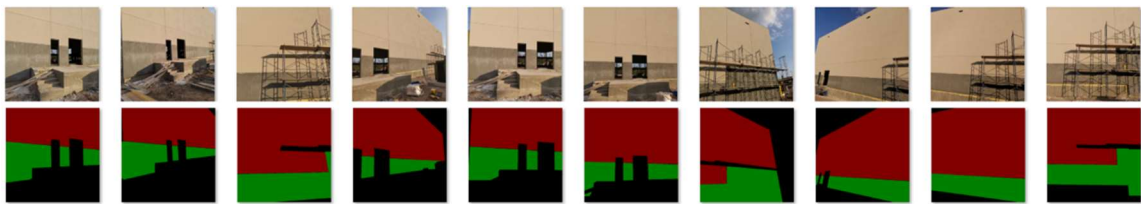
Training images and corresponding labeled images for cement brick wall and external wall
